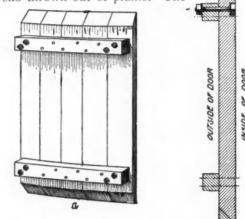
The Finished Door: a, Door showing Outer Face and Cleats: b, Section of Side Wall Showing How Door Fits
